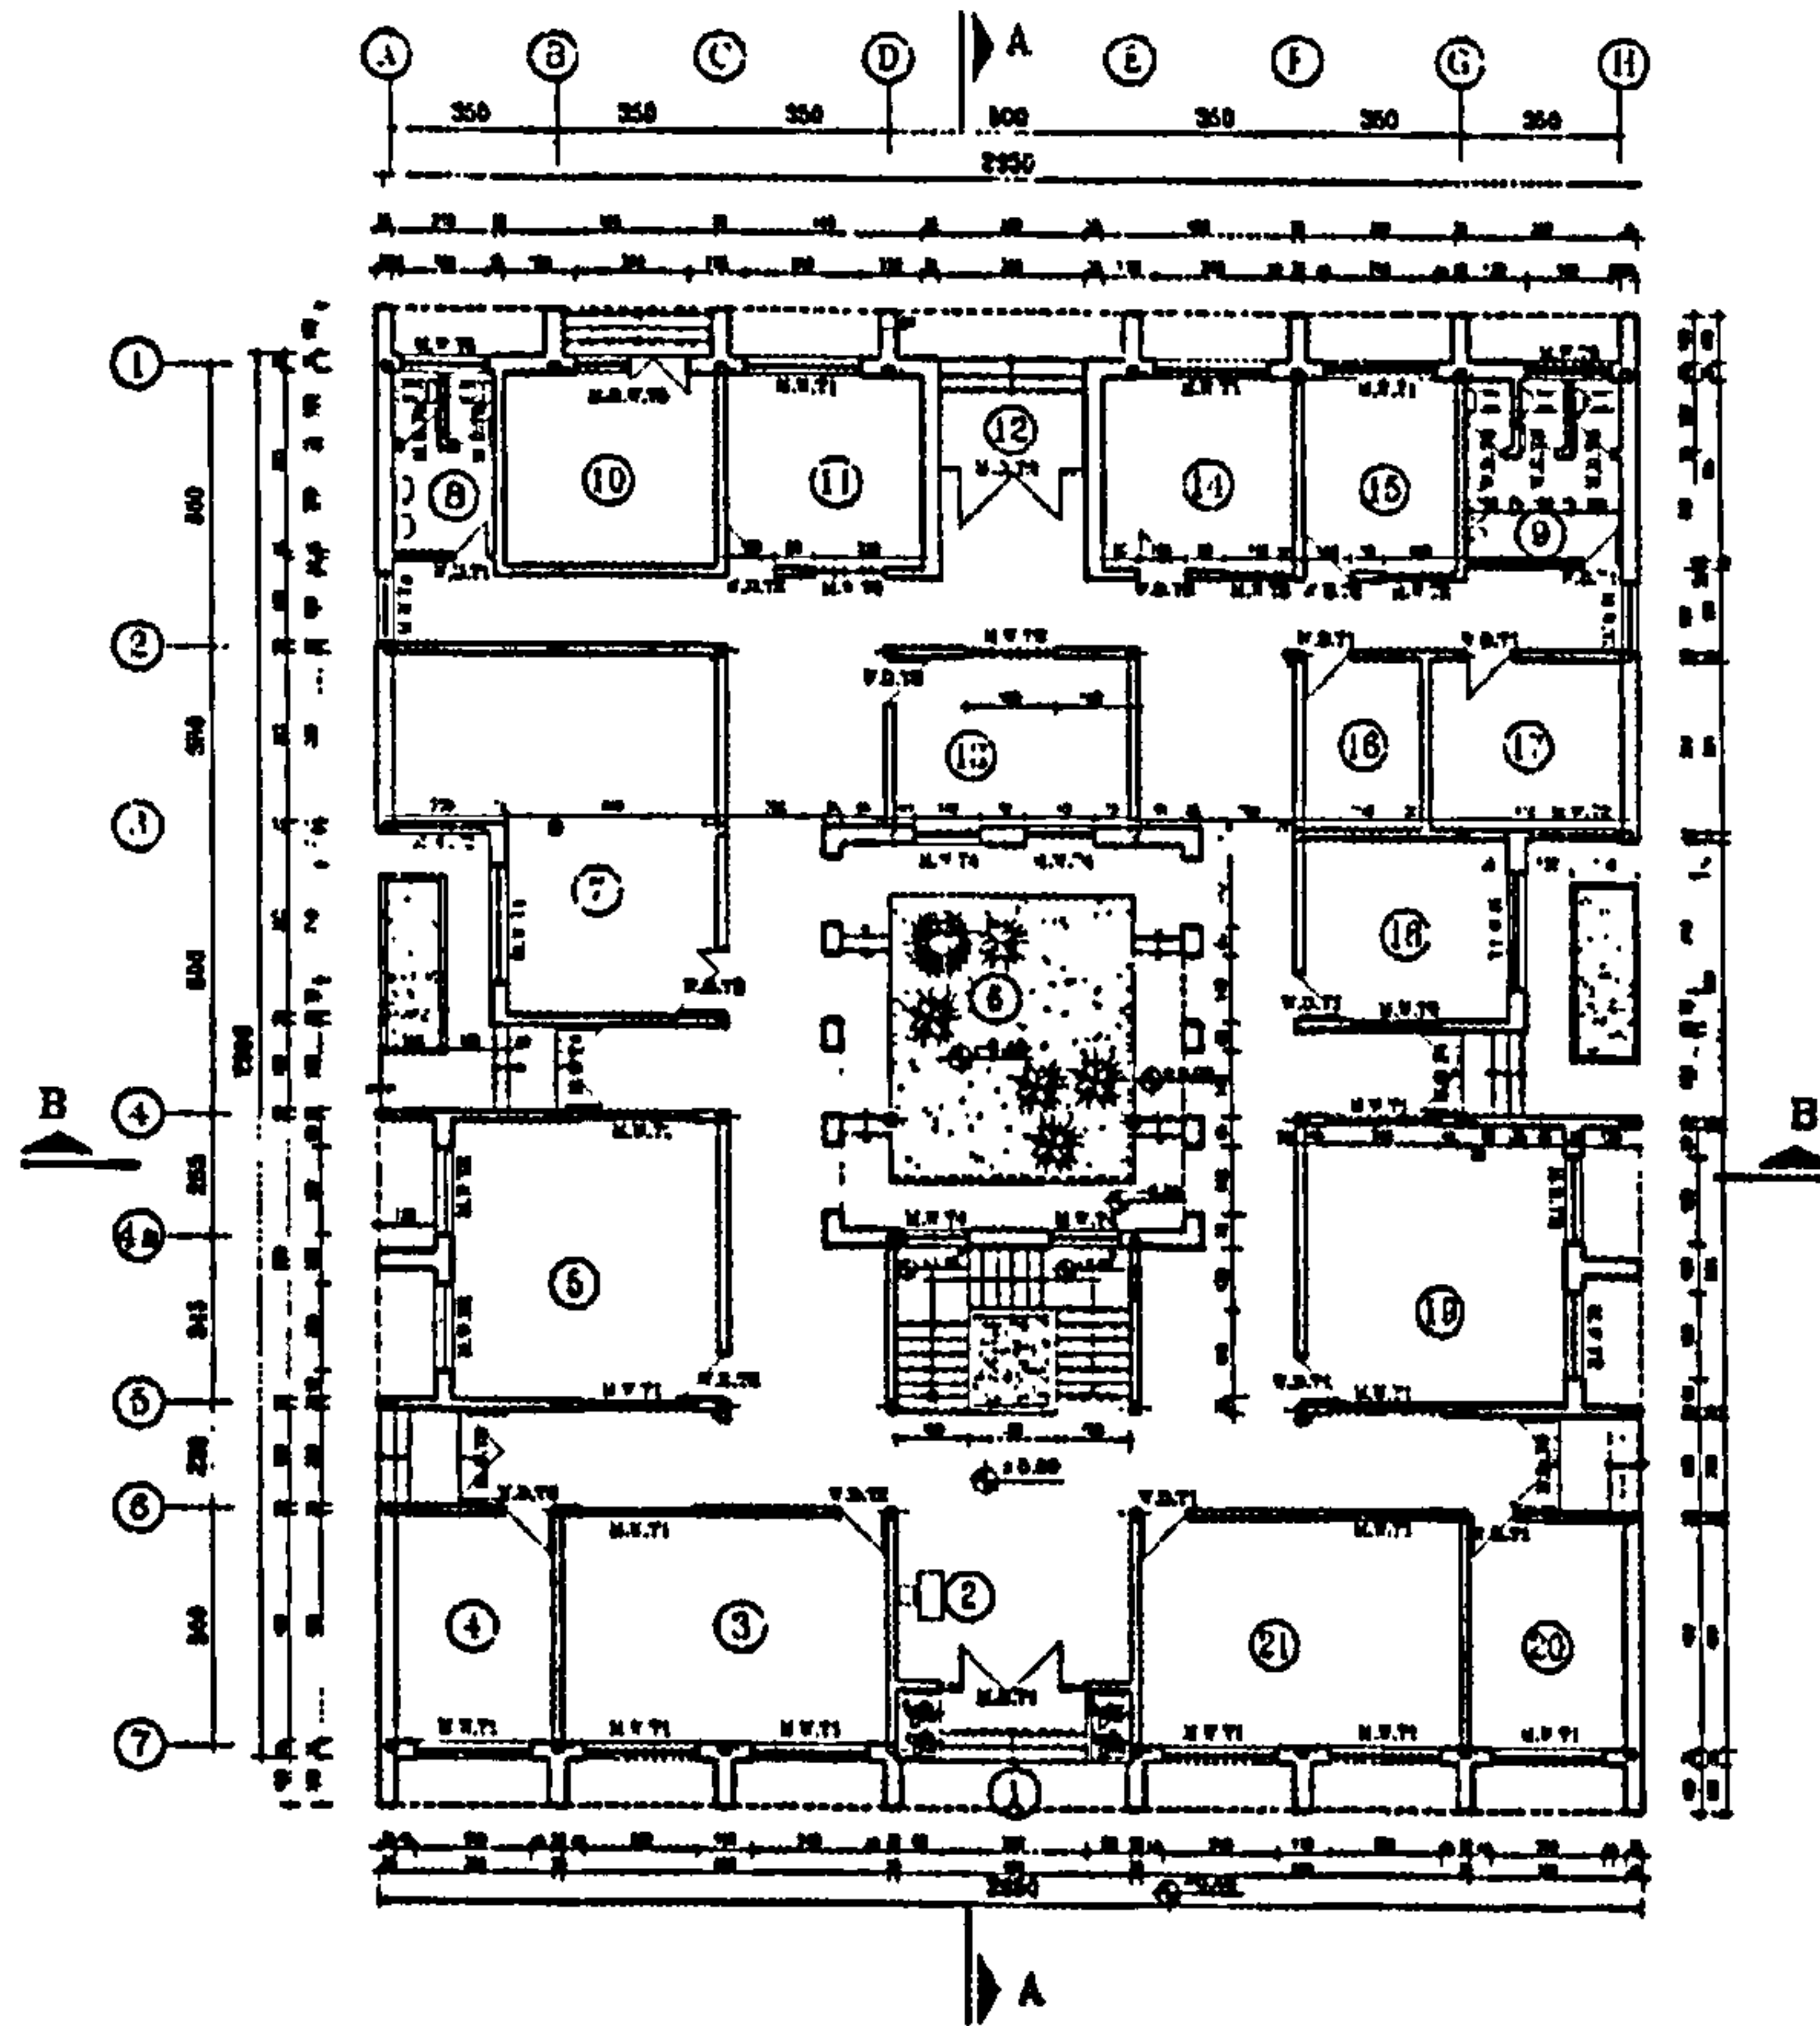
The plan of the first floor of a high school with 9 classrooms (Number 8)
